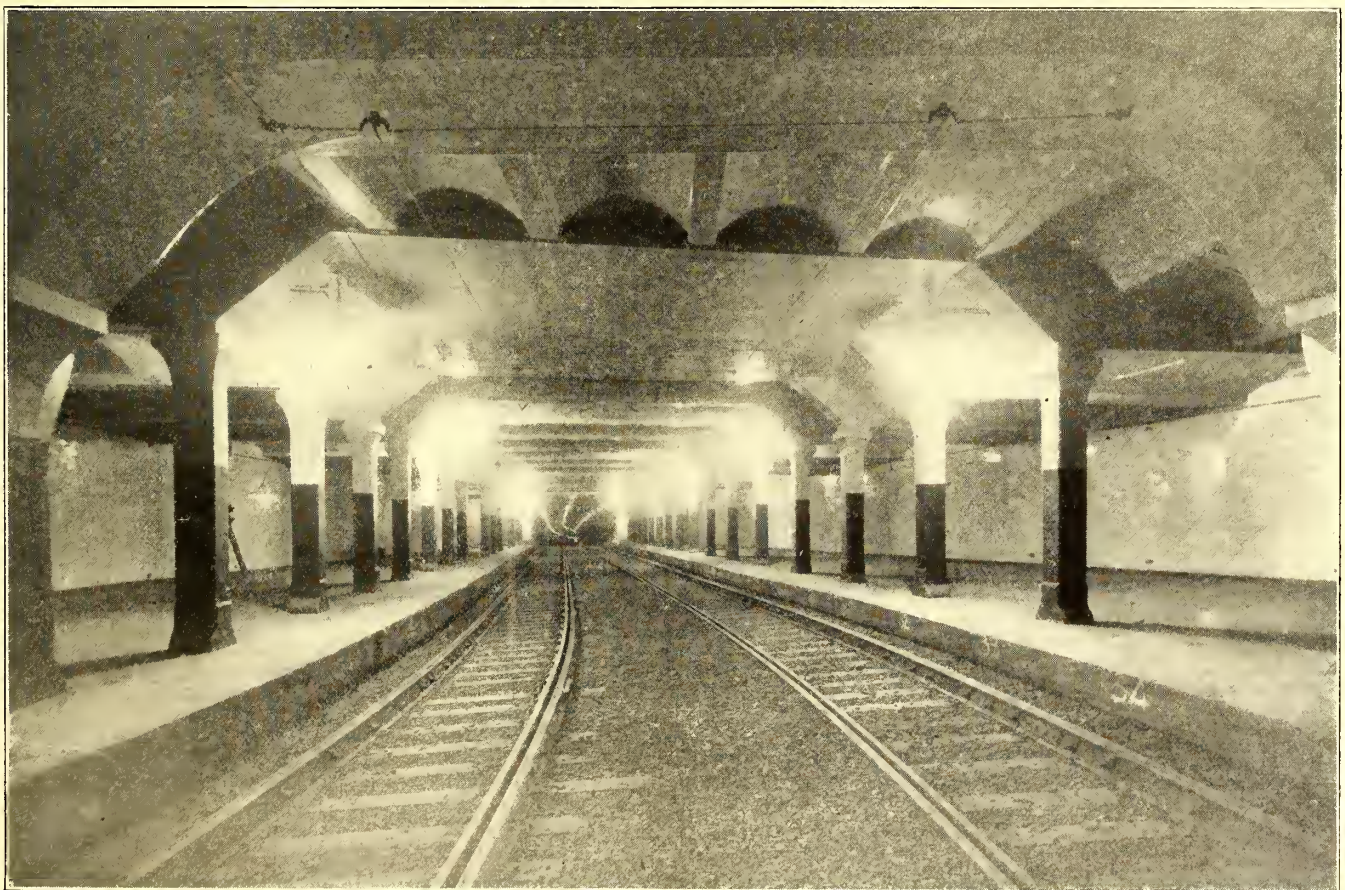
EAST BOSTON TUNNEL, DEVONSHIRE STREET STATION
